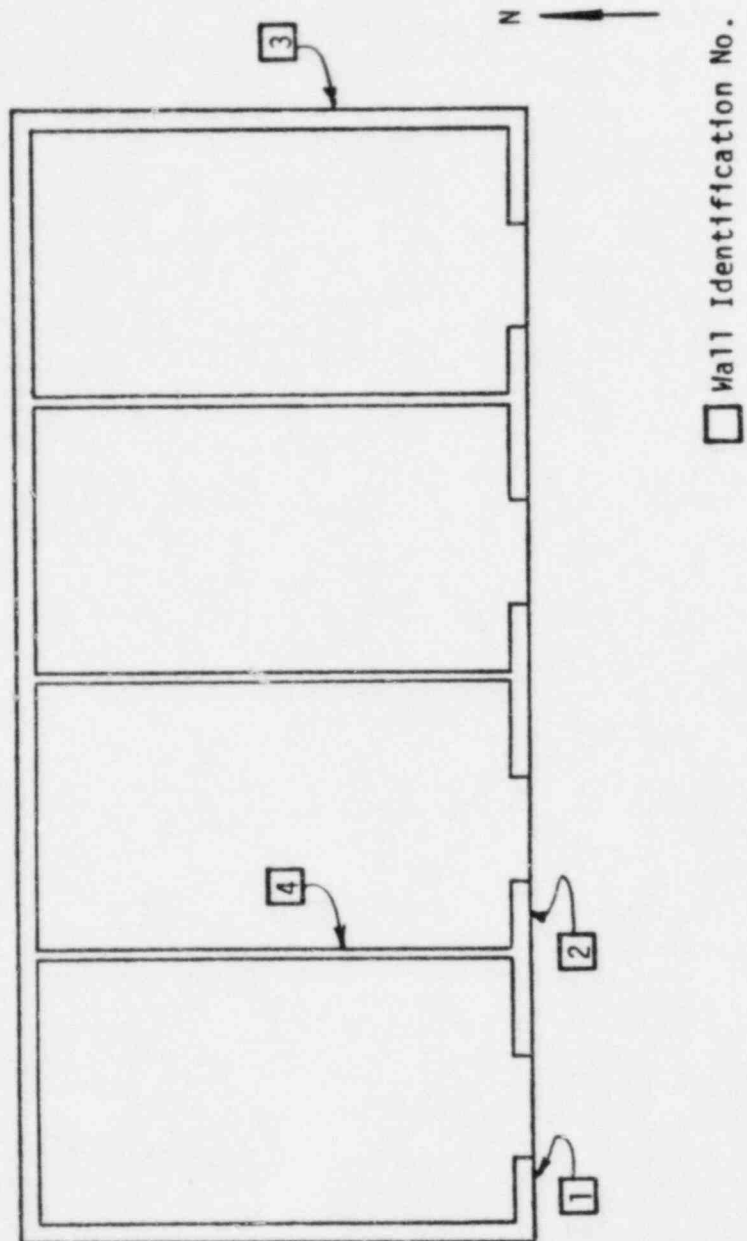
DIESEL GENERATOR BUILDING PLAN, ELEVATION 630' -6"
